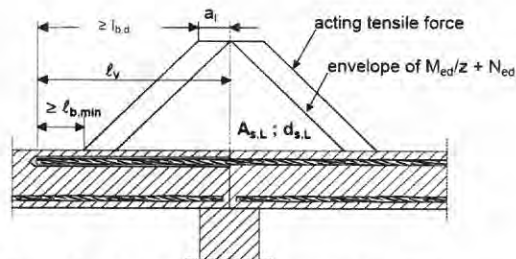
Overlap joint at a foundation of a column or wall where the rebars are stressed in tension
